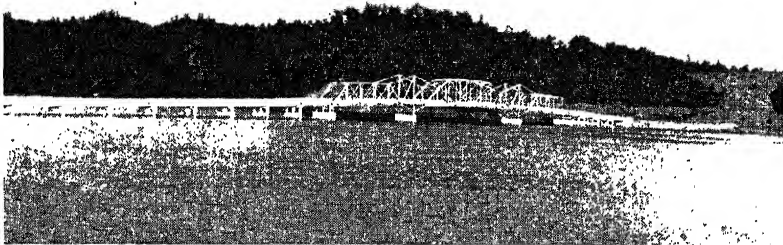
Walters Bridge on United States Highway No. 25E.
